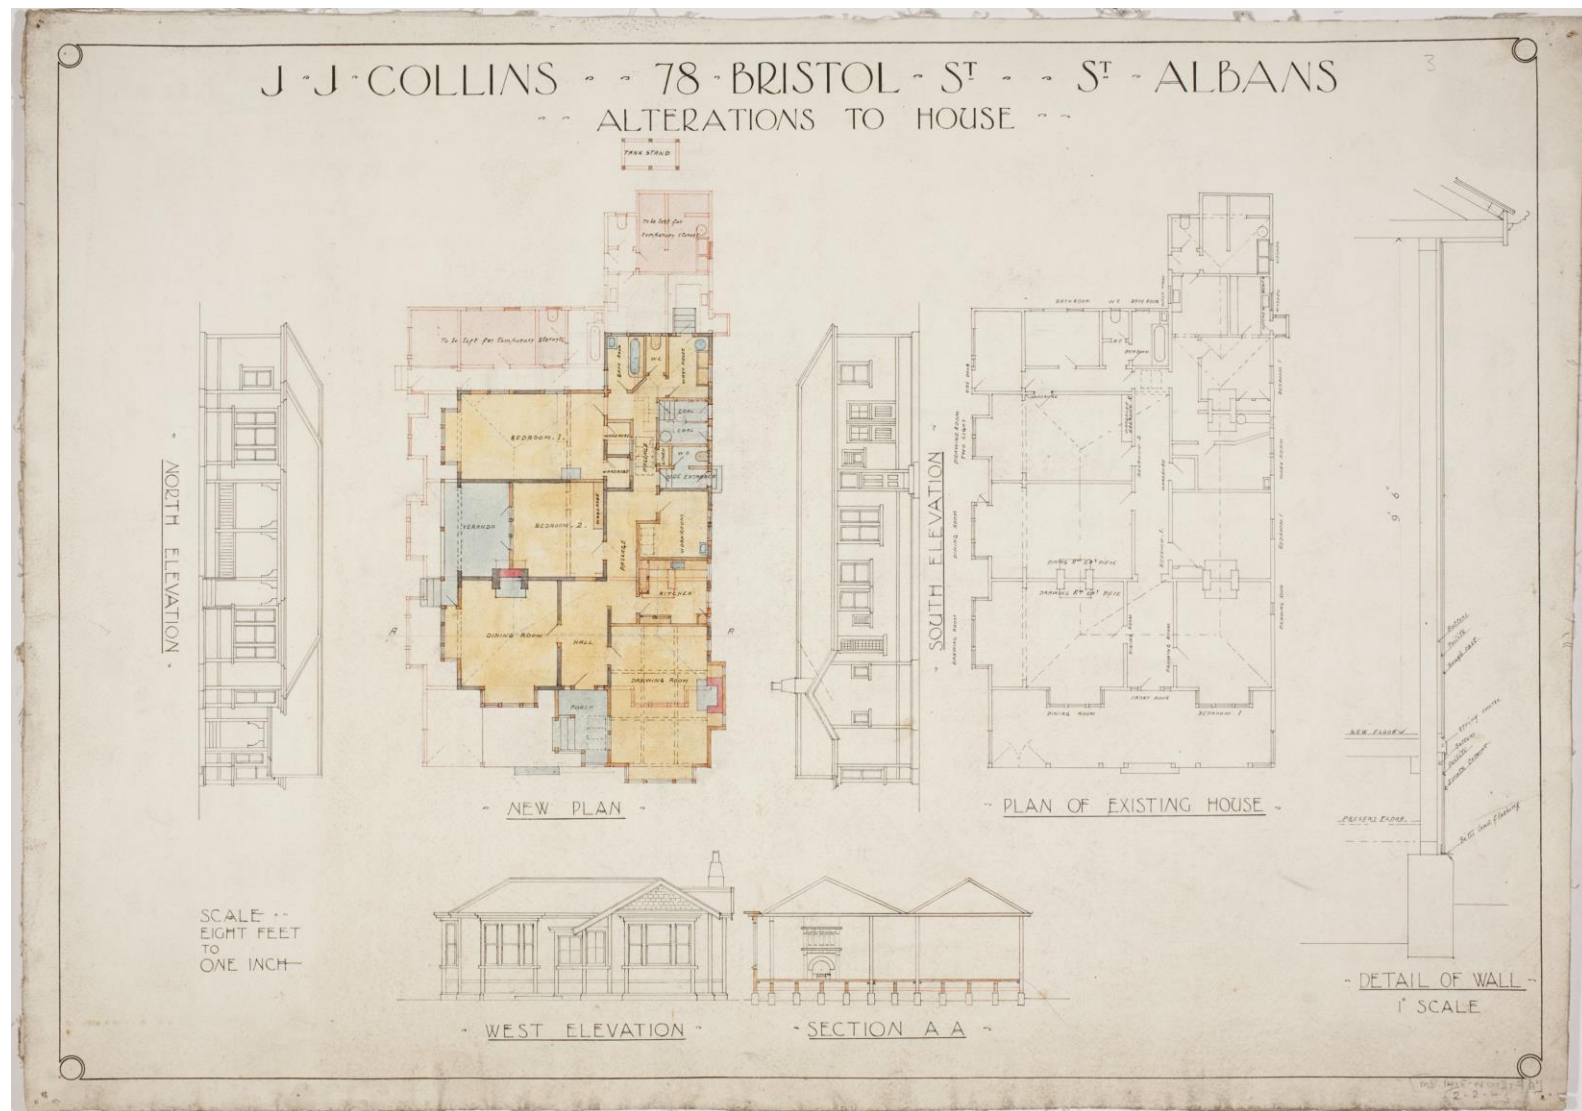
Collins and Harman, J. J. Collins, 78 Bristol St., St. Albans, plans, elevations, section and details (undated).
